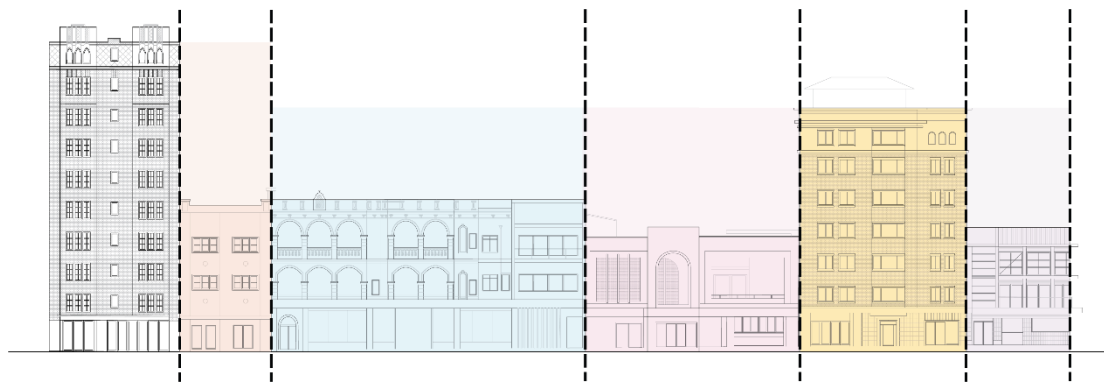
Streetscape massing showing scheme for distinct articulation to building facades. Note: with regard to architectural expression, this scheme shows new development above existing street wall responds to existing fabric immediately below
